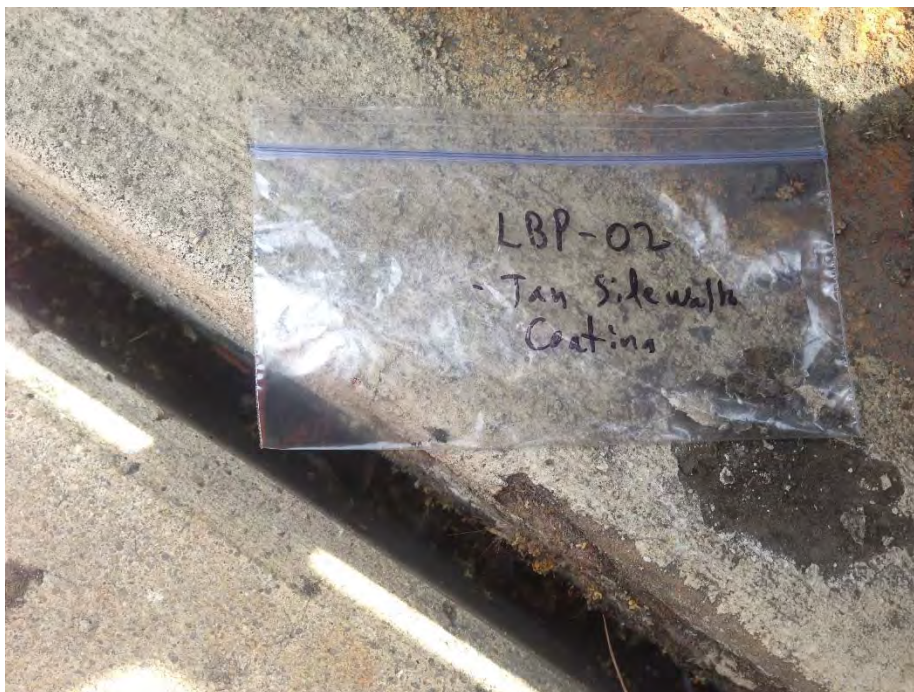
Sample LBP-02 taken from the tan sidewalk coating along the western side of the bridge
